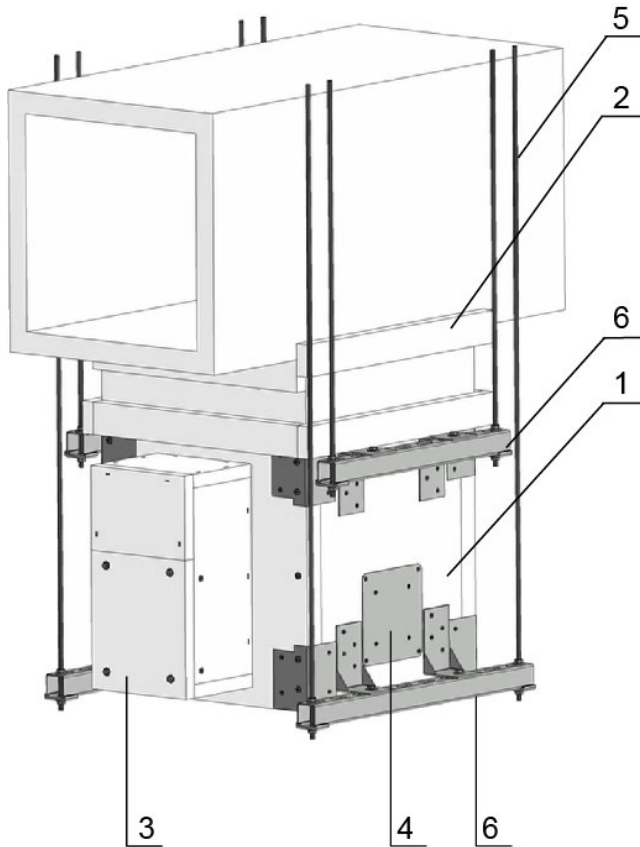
Installation below the horizontal duct with blade and spindle in horizontal position.
